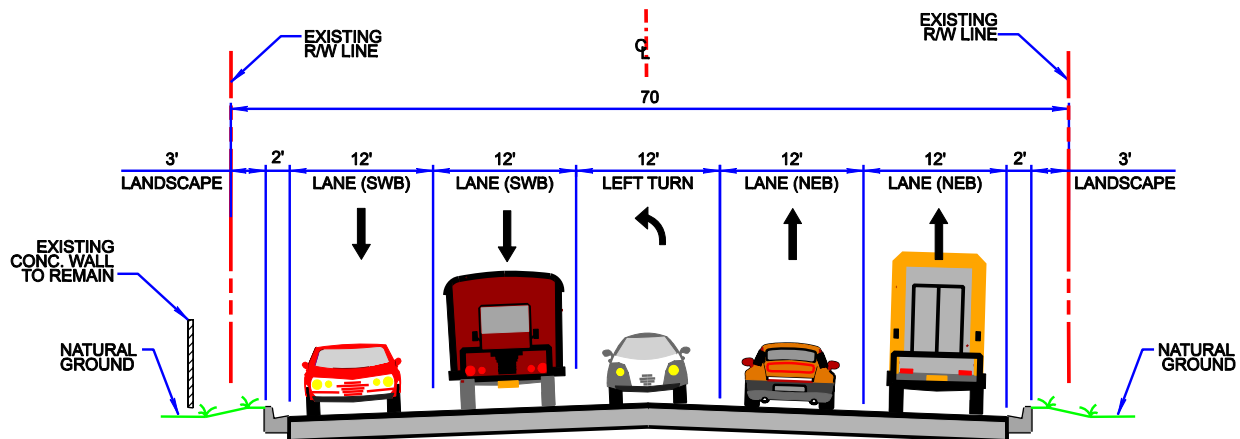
A NW 138th Street from NW 113 Avenue to SR-25 (Okeechobee Road) (2008)
